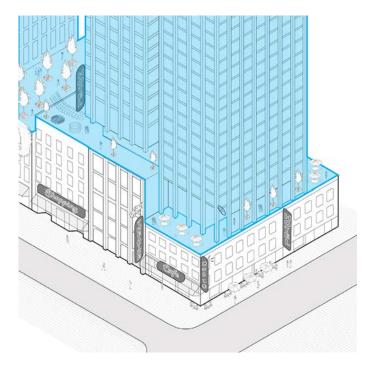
An illustration showing upper-level tower setbacks, including both horizontal setbacks and a vertical recess of the contemporary building from the heritage property.
